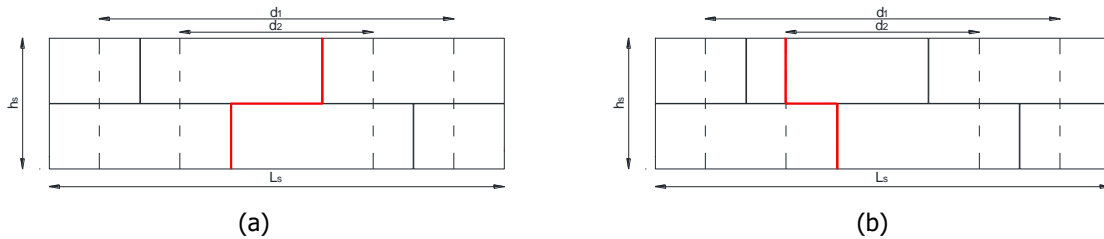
Crack patterns of CS element masonry subjected to in-plane bending: (a) stepwise crack alternating through joints; (b) splitting of the units and stepwise crack through joints.
